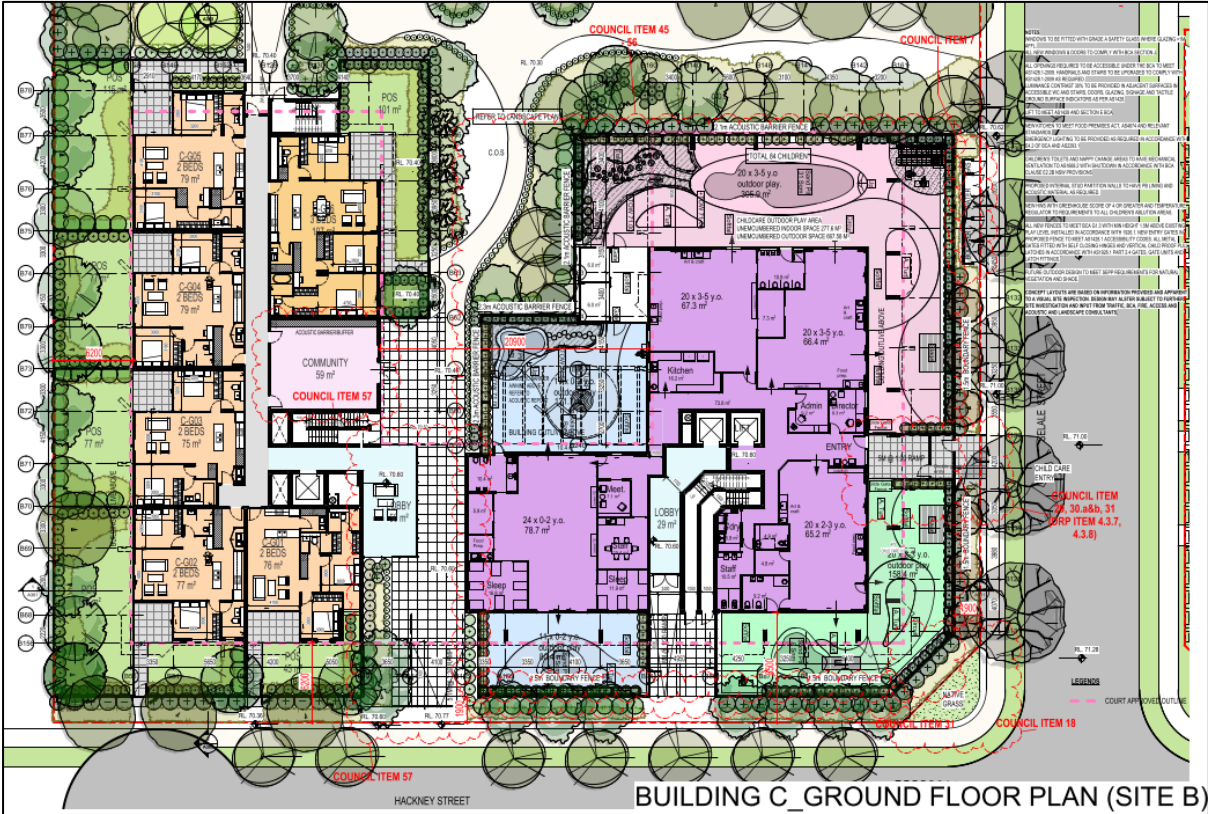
Ground Floor Plan Building C – including Childcare Centre.
